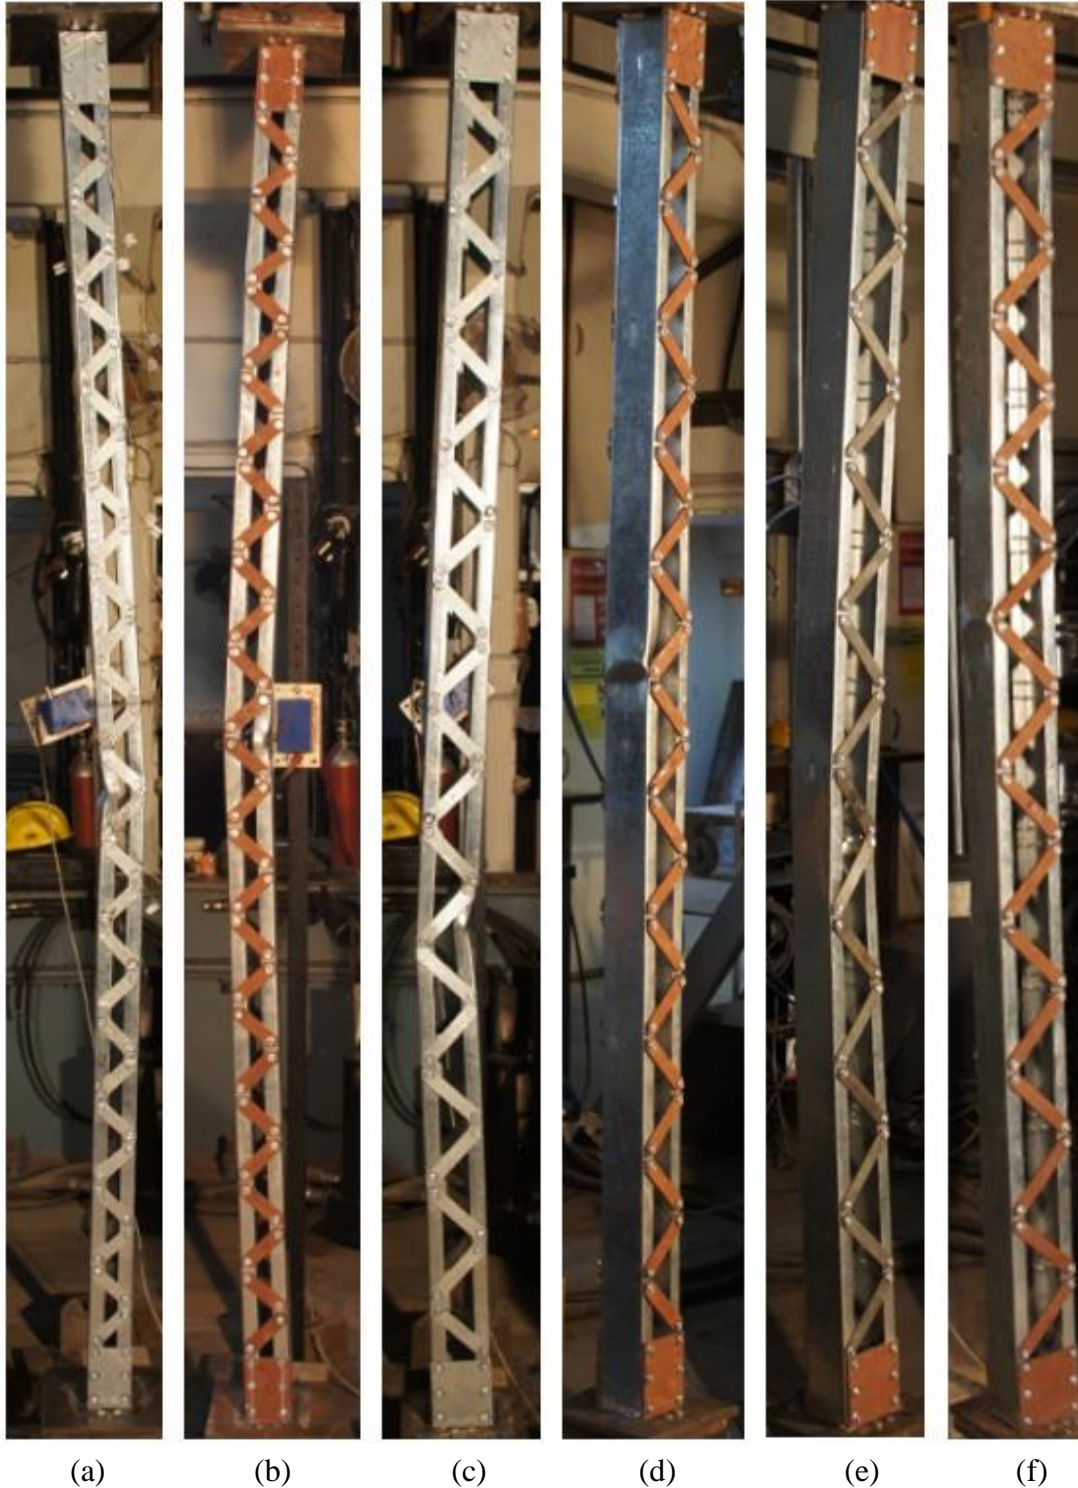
Failure in the test specimens, (a) SL-25-2.5; (b) SL-25-6; (c) SL-50-2.5; (d) SL-50-6; (e) SL-65-4, and (f) SL-75-6.
